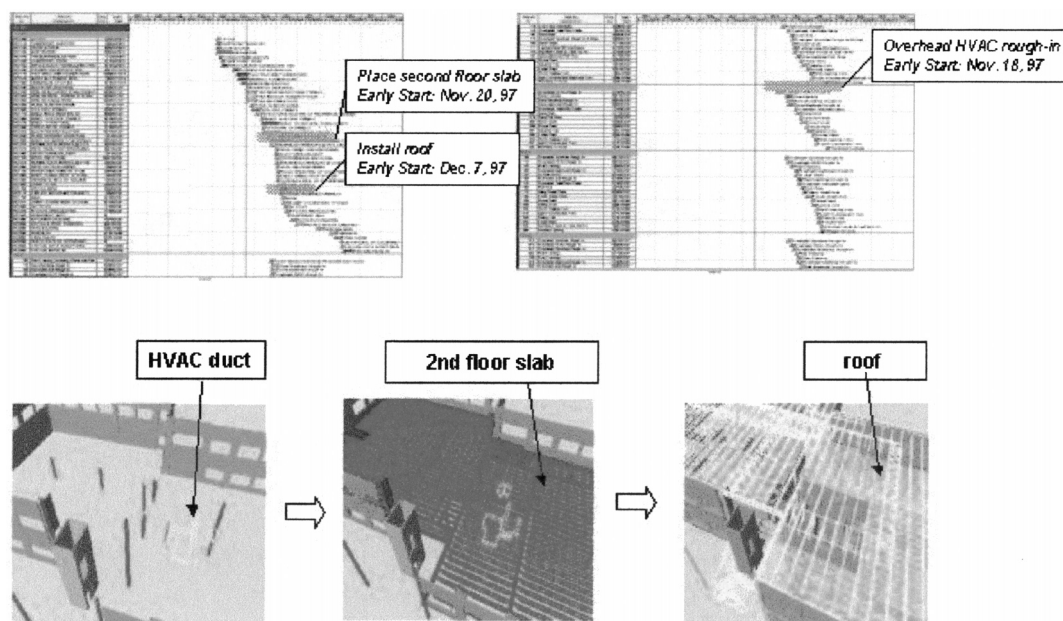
4D Model Showing HVAC Ducts Being Installed prior to 2nd-Floor Frame and Truss and Roof
